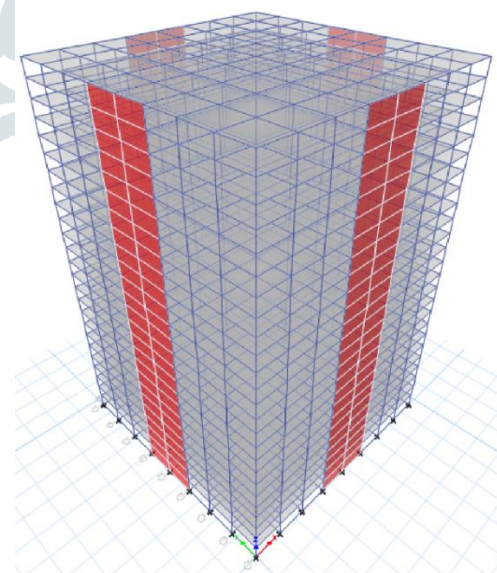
3-D view of structure with RC shear wall provided at side centre
